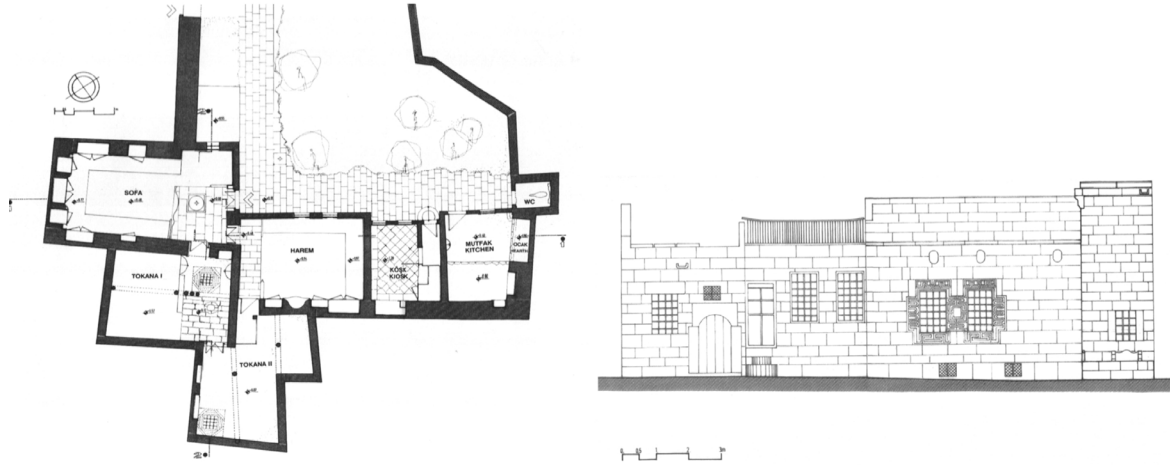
Examples from Traditional Kayseri Houses, ground floor plan and east elevation of House Öztaşcı House, 19th Century, Muslim house example (İmamoğlu, 2006).
